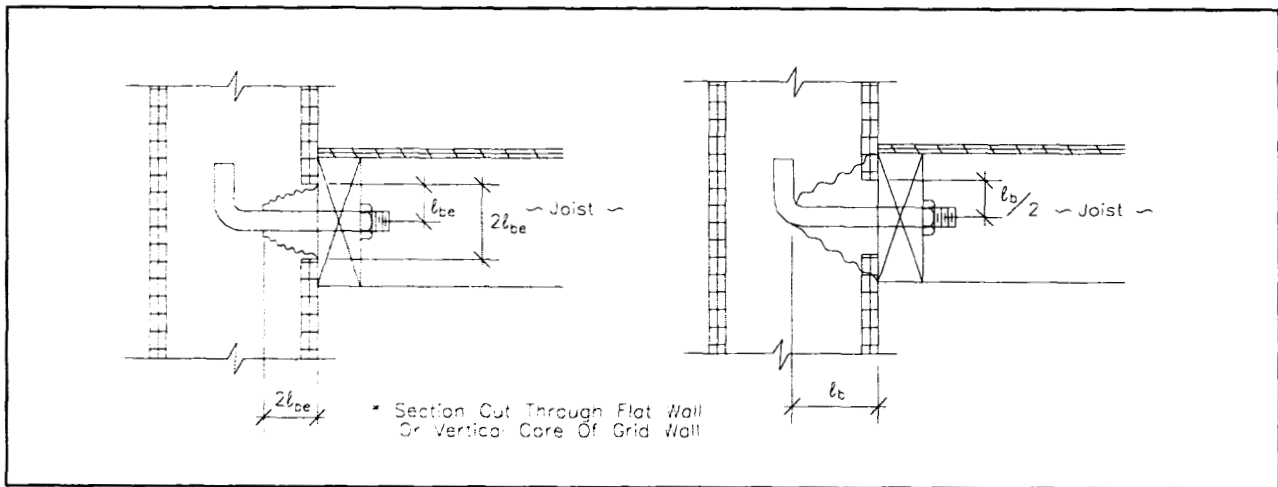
Assumed Cone Shear Failure Surface for Ledger Connection
